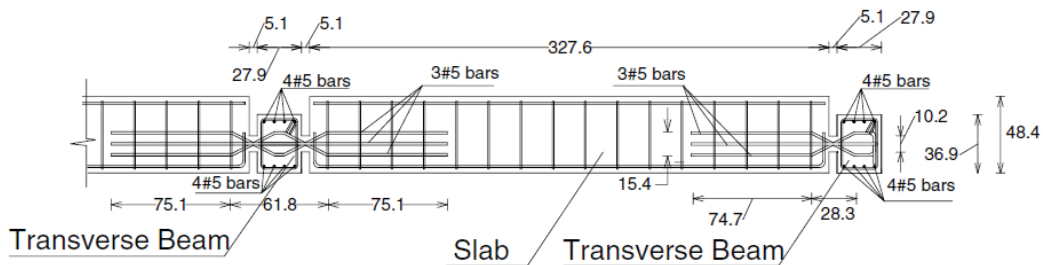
The Transverse Beams and Slab Reinforcement Detail
